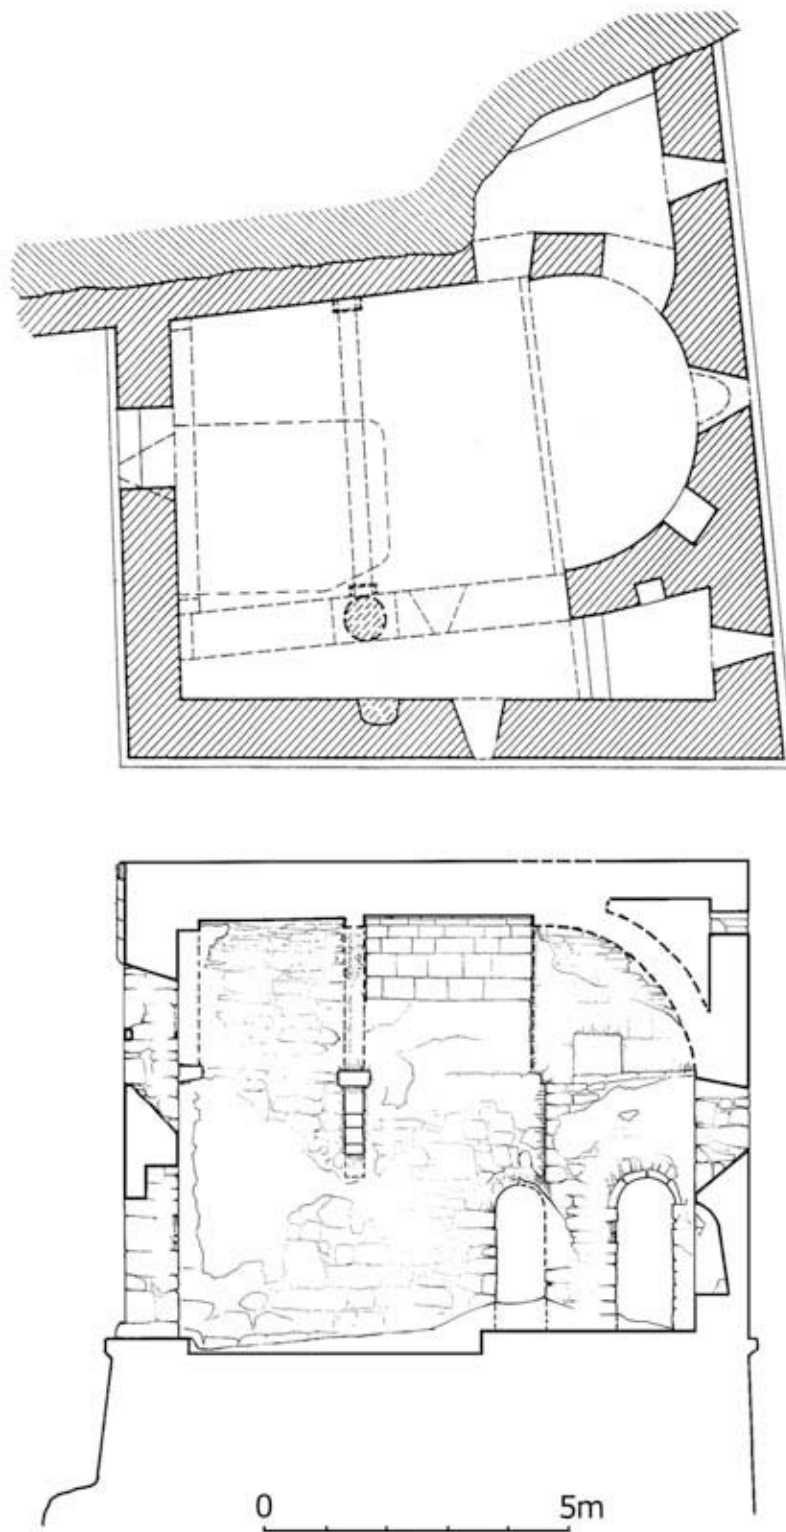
Nuka-Saqdari. Plan and longitudinal section looking north
